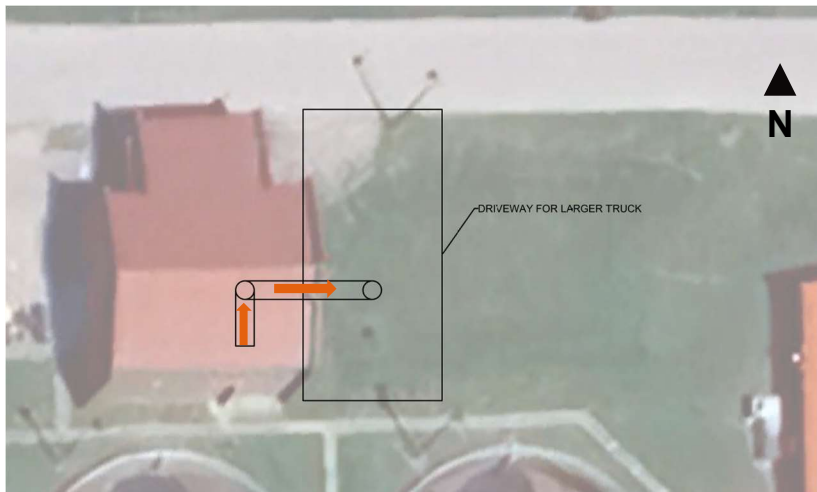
Site Layout of Screw Conveyors to Driveway
